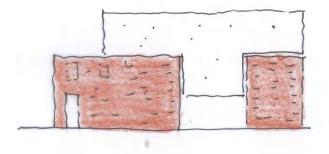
Nimrod Street. Existing brickwork facade and new concrete addition.
